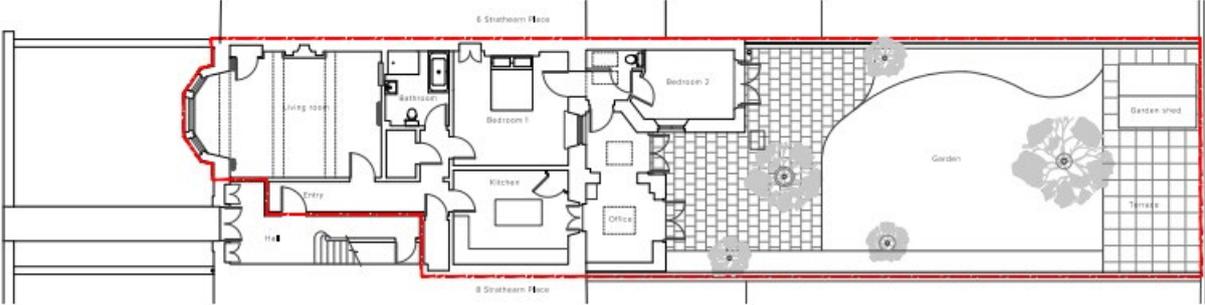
Our existing plans with the existing 100% width extension footprint and the long narrow garden.
